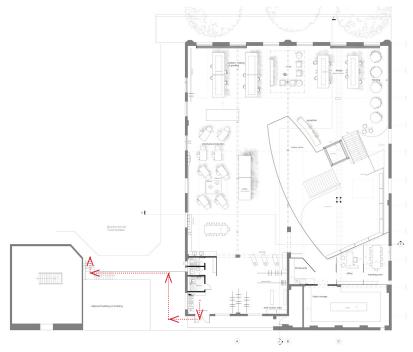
First floor fire exit route-not to scale (Author 2013)
